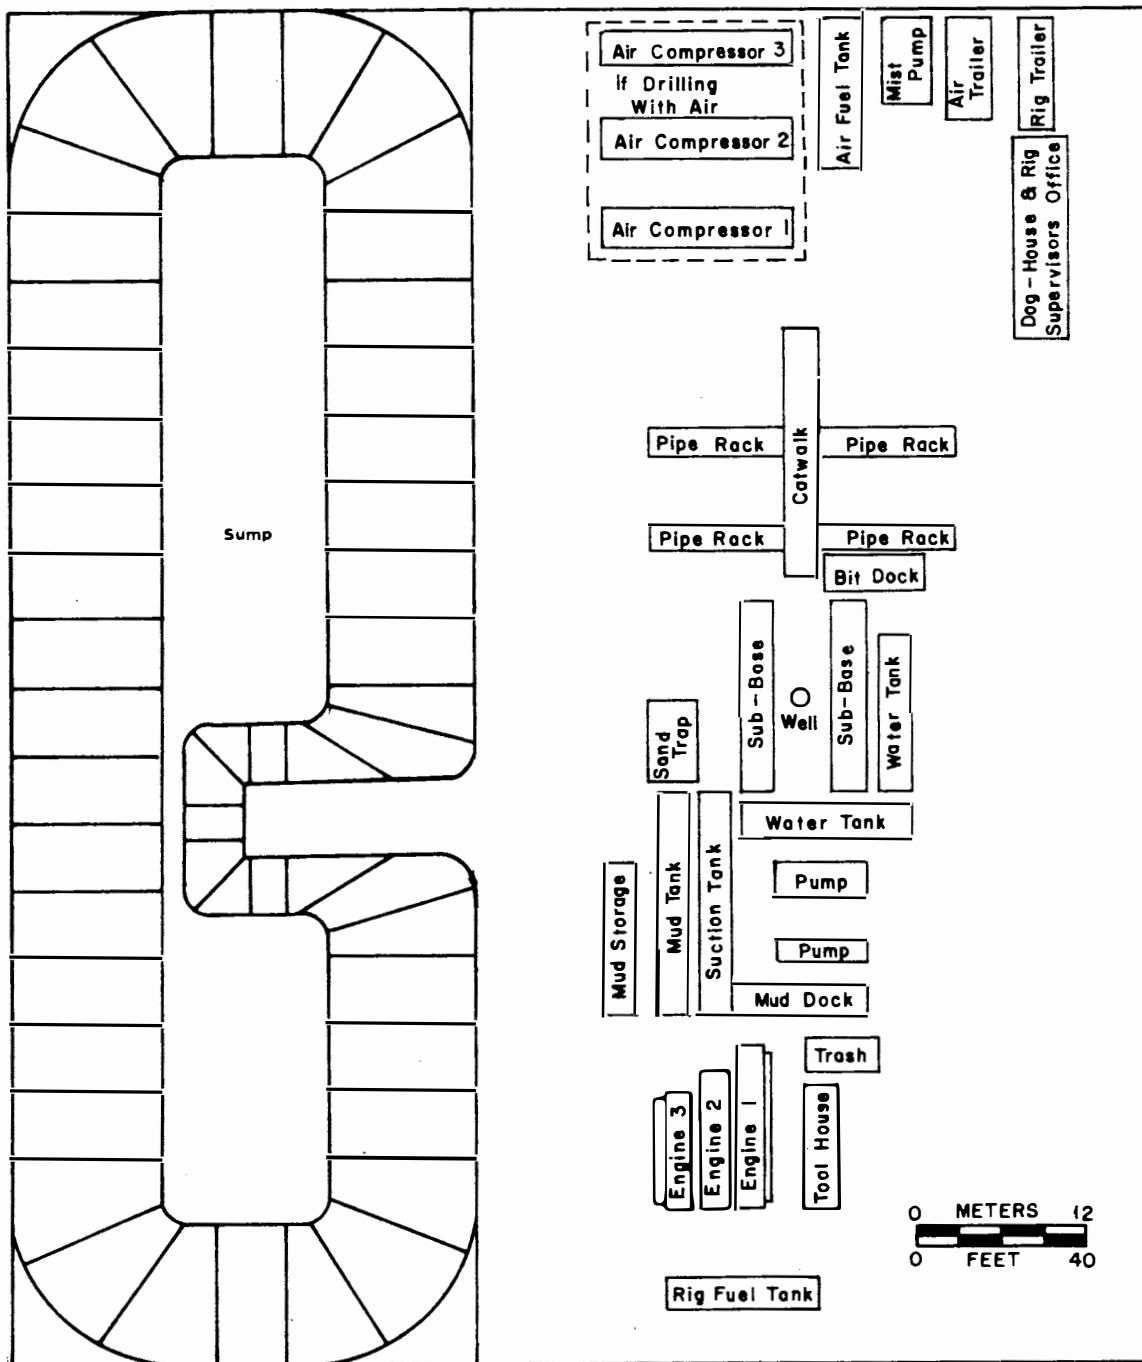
Typical equipment layout of a geothermal exploration well.
